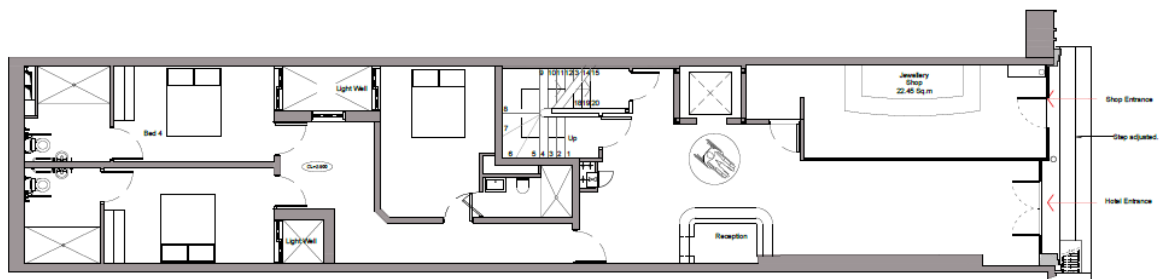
Proposed Ground Floor Plan (drawing no. HGH-P01-RevG)
